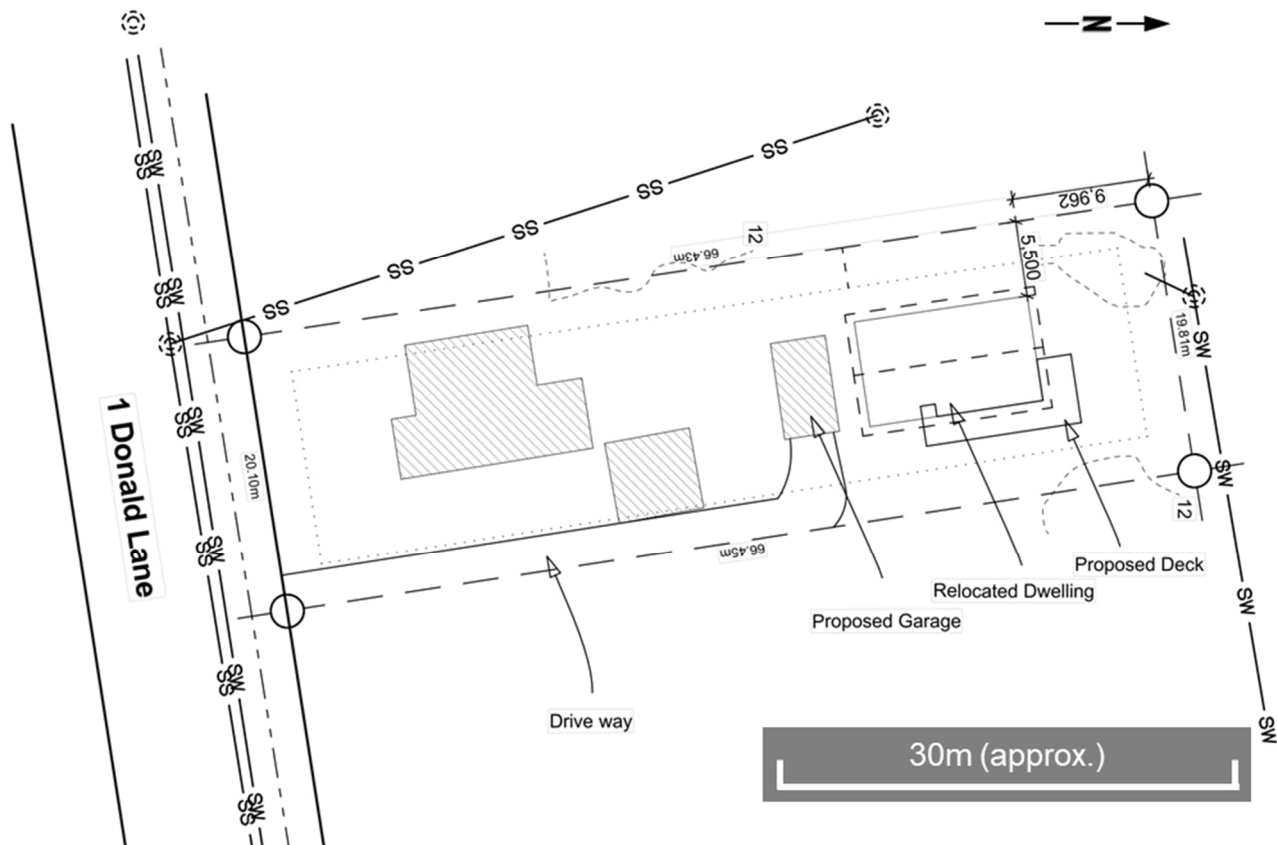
Site plans of proposed relocatable dwelling. Plans supplied by Advance Design Architecture.
